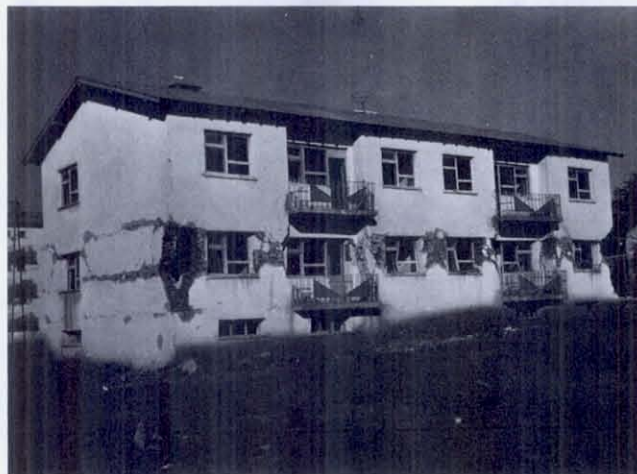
This figure and the six following figures show successive views, moving counterclockwise, of a badly shattered apartment house in Bingöl. This view shows principally the north face, as well as the east end wall. A floor plan of the building, made from measurements, is shown later. Note that damage is confined almost exclusively to the first story - perhaps due to the brittle nature of the masonry. Cracking of the first story possibly resulted in reduced lateral force in the second story.
